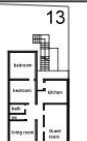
Ground floor samples of mutated type I with the addition of staircase in back façade (Author, 2017)
